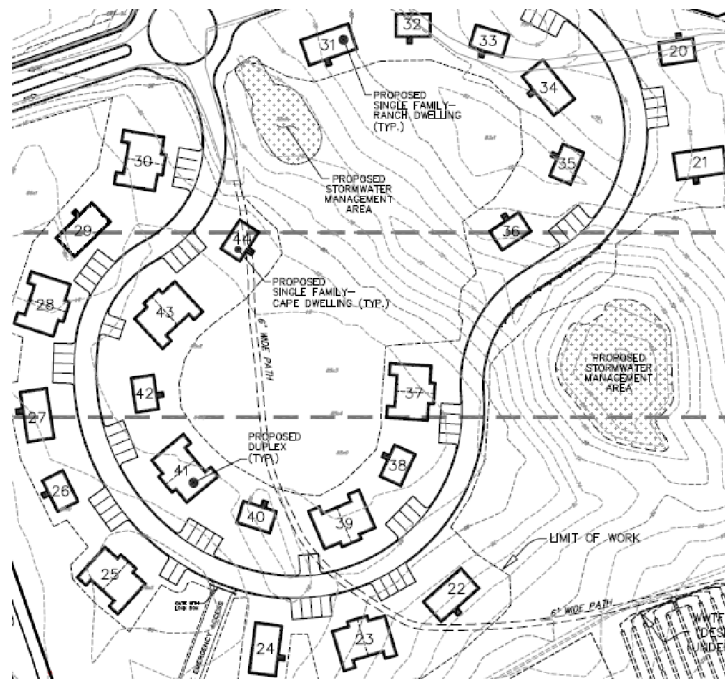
South side of planned housing development off of Meetinghouse Road in Mashpee, MA. Few houses are currently facing north-south, which is the best roof orientation for rooftop solar PV.
